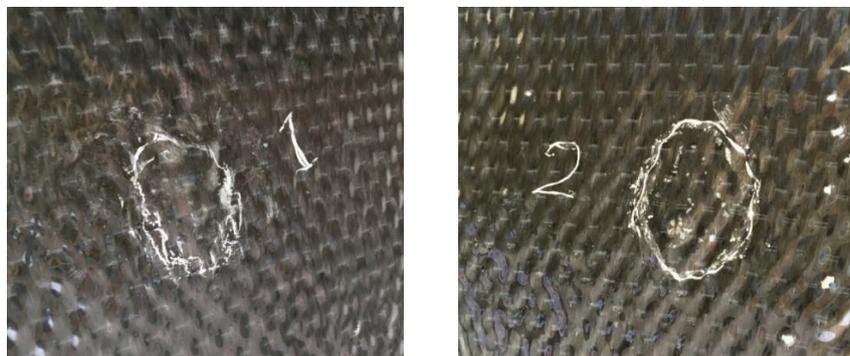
Marked and labelled debonded areas in the CFRP bonded concrete box beams of Whiteday Creek Bridge
